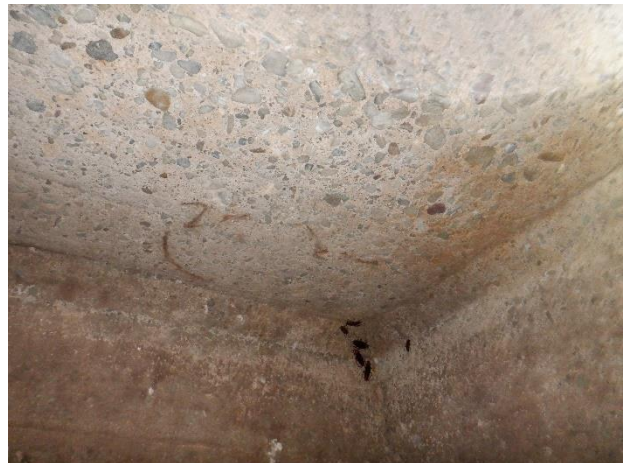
6. Exposed aggregate on roof of manhole structure.
